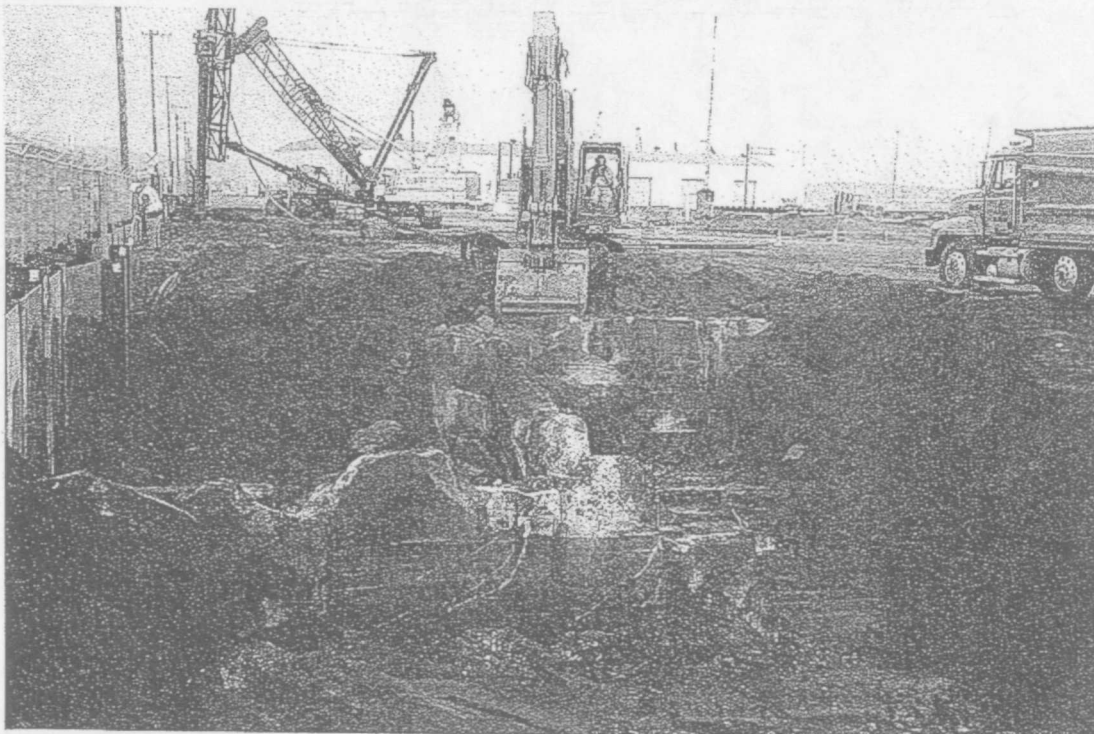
Shoring installation (typical) along Front Avenue (looking north).
